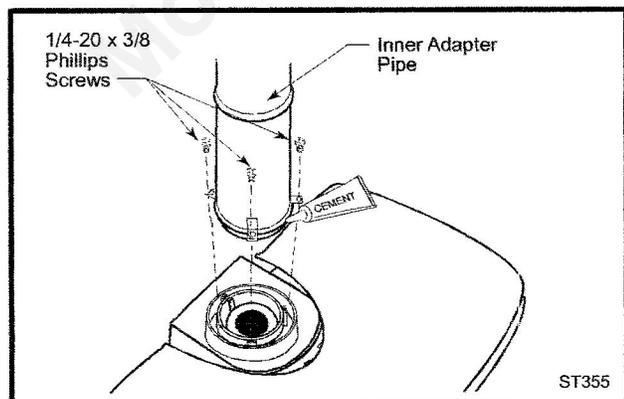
Simpson Dura-Vent - install inner adapter pipe.
